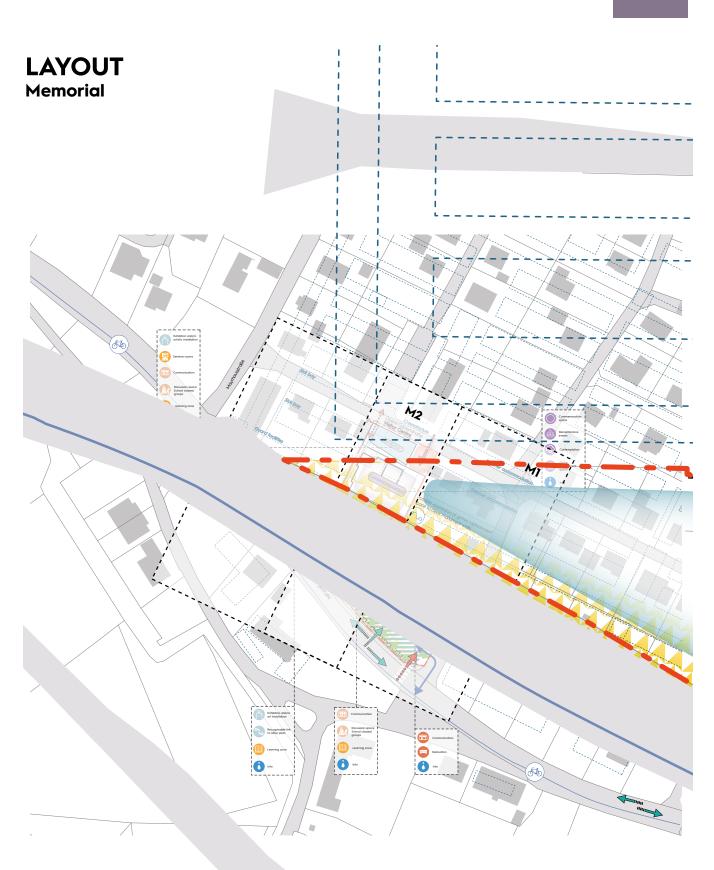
Master Plan - memorial site layout (Sections M1 to M2 shown on the following pages)
